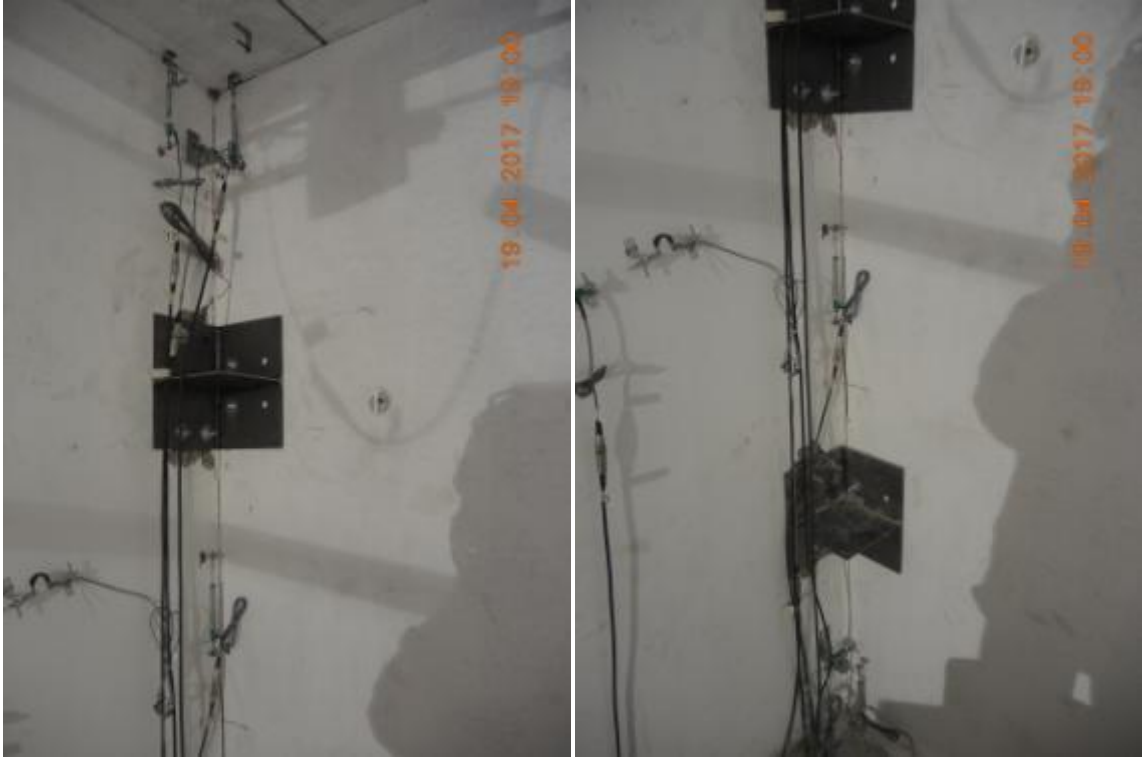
Damage pattern of retrofitted three-way connections – West side, North face, second storey.
